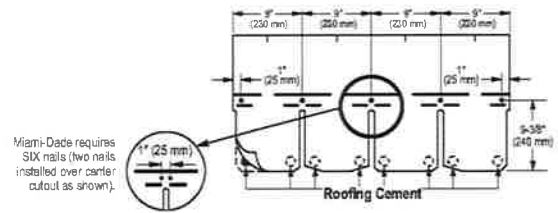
A: Use FIVE nails and eight spots of asphalt roofing cement under each tab corner.
